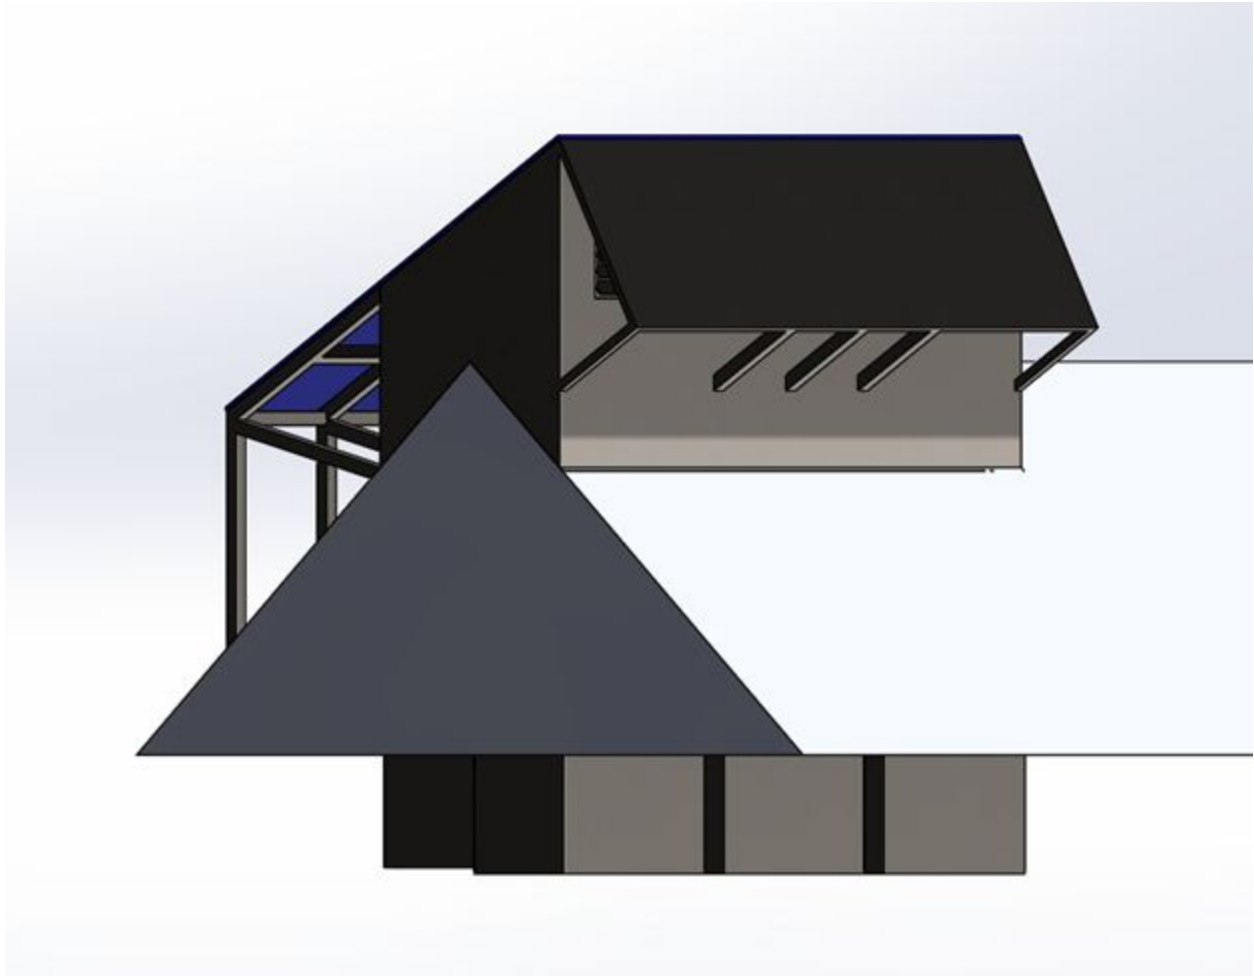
Quartering North Face of final design sitting on roof attached to 3 exhaust ducts
